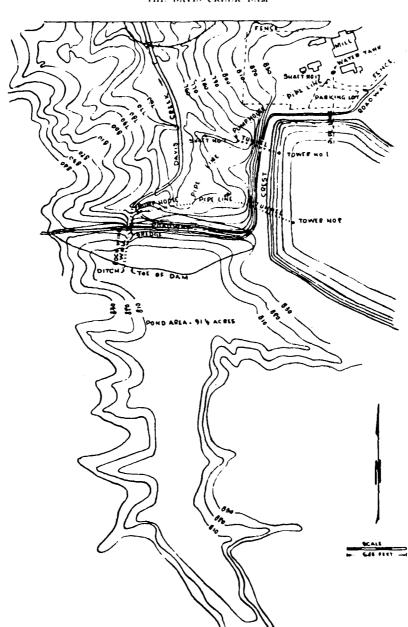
DAVIS CREEK SLIME POND AFTER BUILDING OF DAM.
